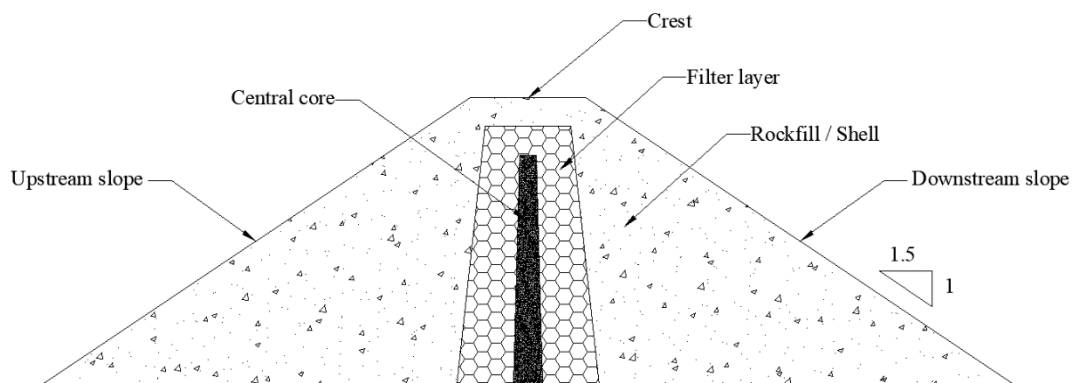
Sketch of a rockfill embankment dam with a central core (erosion protection on dam slopes not shown)
